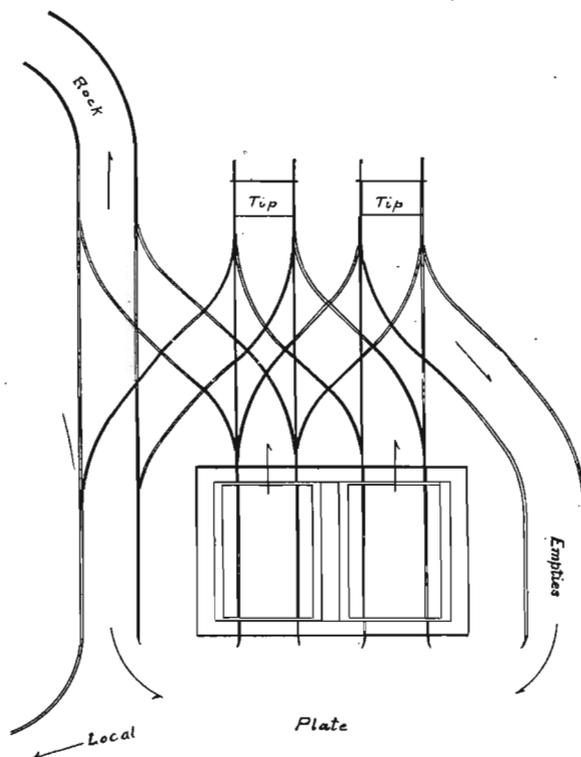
Diagram showing arrangement of tracks and switches in the Whitebreast tippie.
